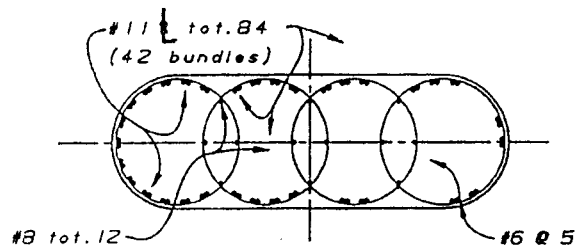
Cross – Section of Piers of Santa Clara Bridge.
